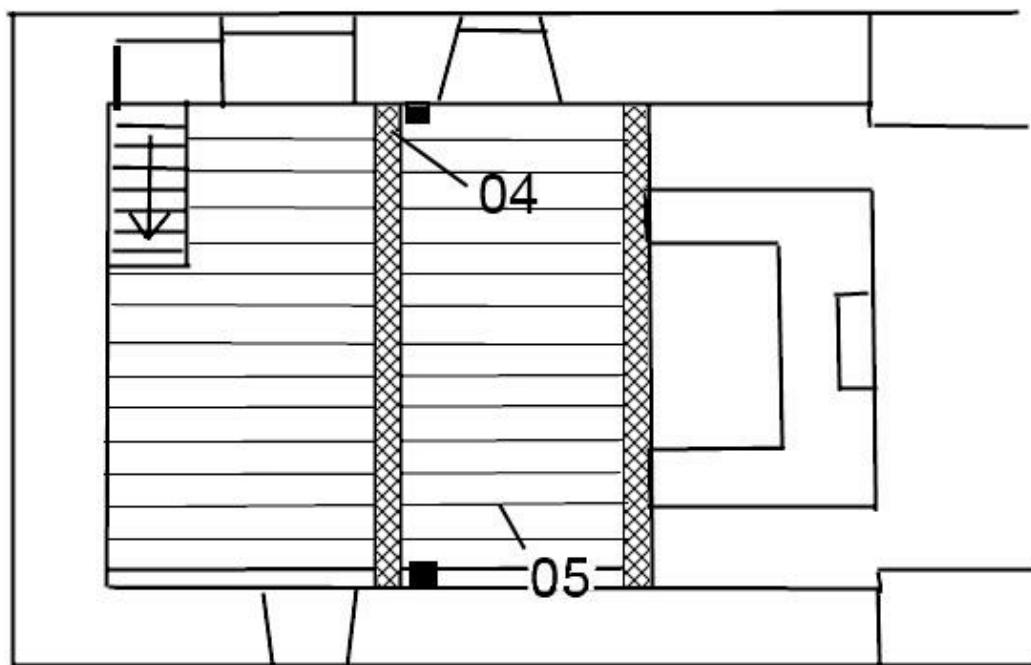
Ground floor of the cruck wing, showing timbers sampled in the inserted 'Elizabethan' floor
